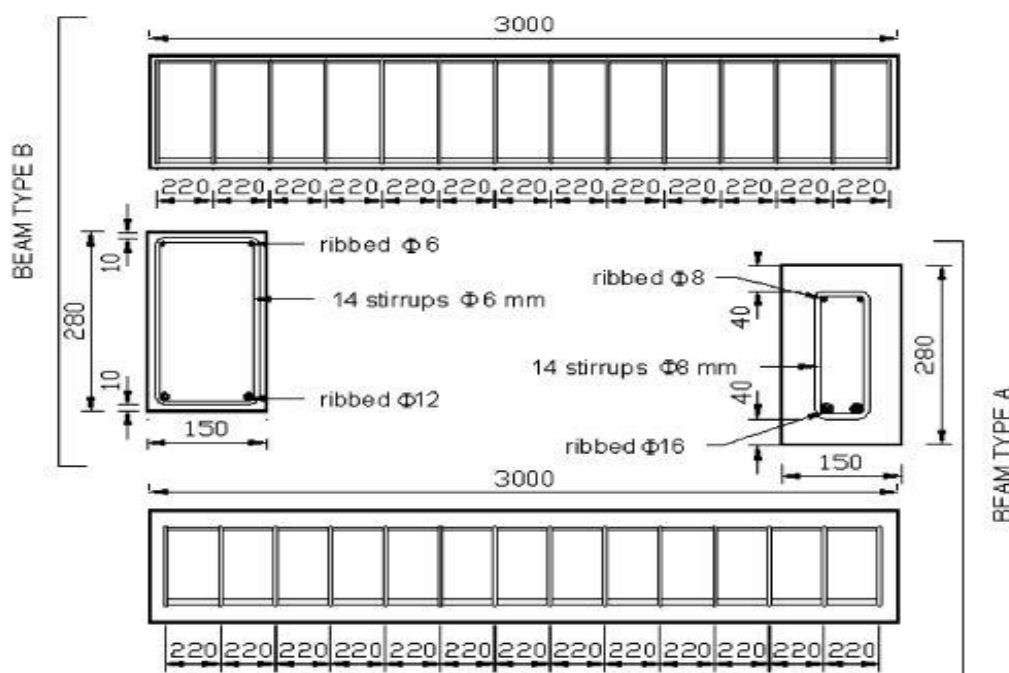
Layout of reinforcement for Beams A and B (Vidal et al, 2004)
